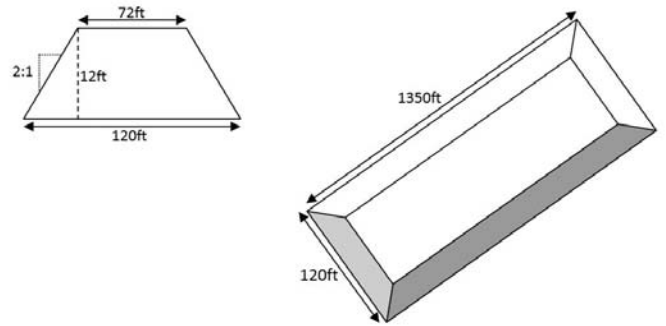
Settlement Prediction Embankment Dimensions (Getchell, 2013).
